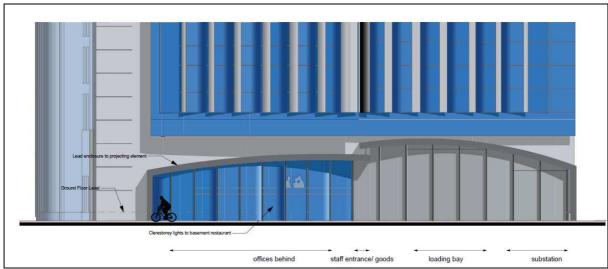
Appeal Scheme lower level design and treatment (Buckle Street Elevation)
